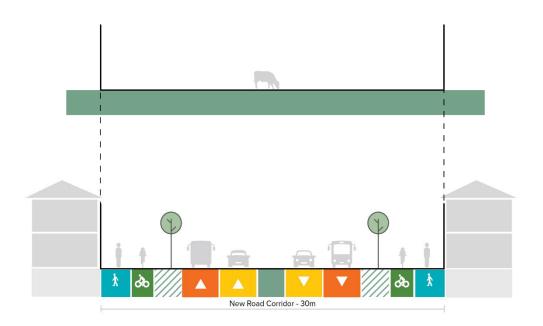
Ōpāheke N-S FTN corridor typical cross section
